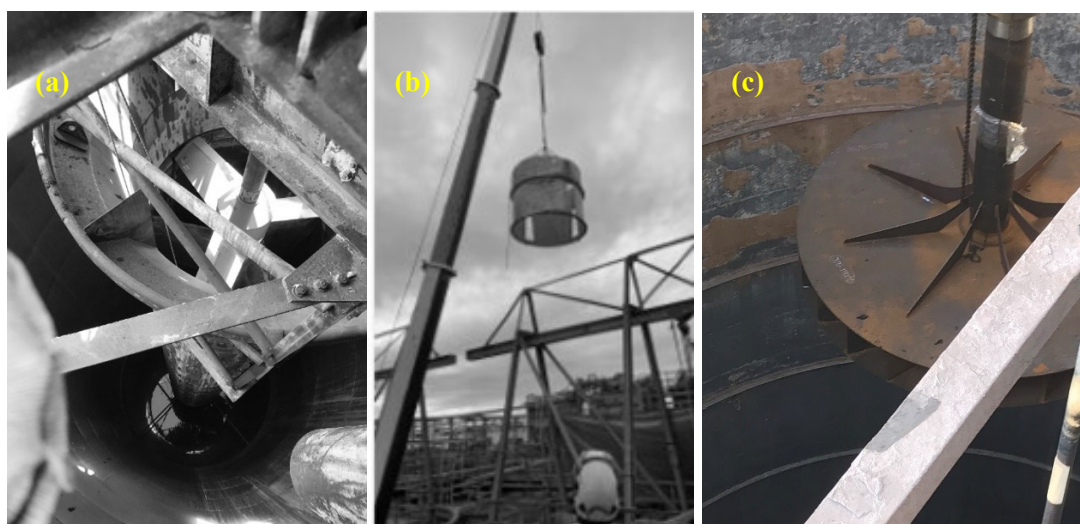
Conversion to SWIRLFLOW®, showing a) draft tube, b) removing draft tube section-by-section and c) SWIRLFLOW® installation completed. (note: to avoid revealing some sensitive information, image color and size have been modified)
